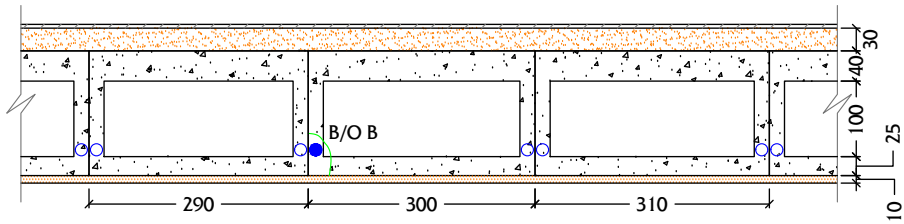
PART SECTION LOOKING EAST THROUGH ROOF SLAB SHOWING DETAILS OF PRECAST CONCRETE PLANK - SURVEY AREA RS2 SCALE 1:5
